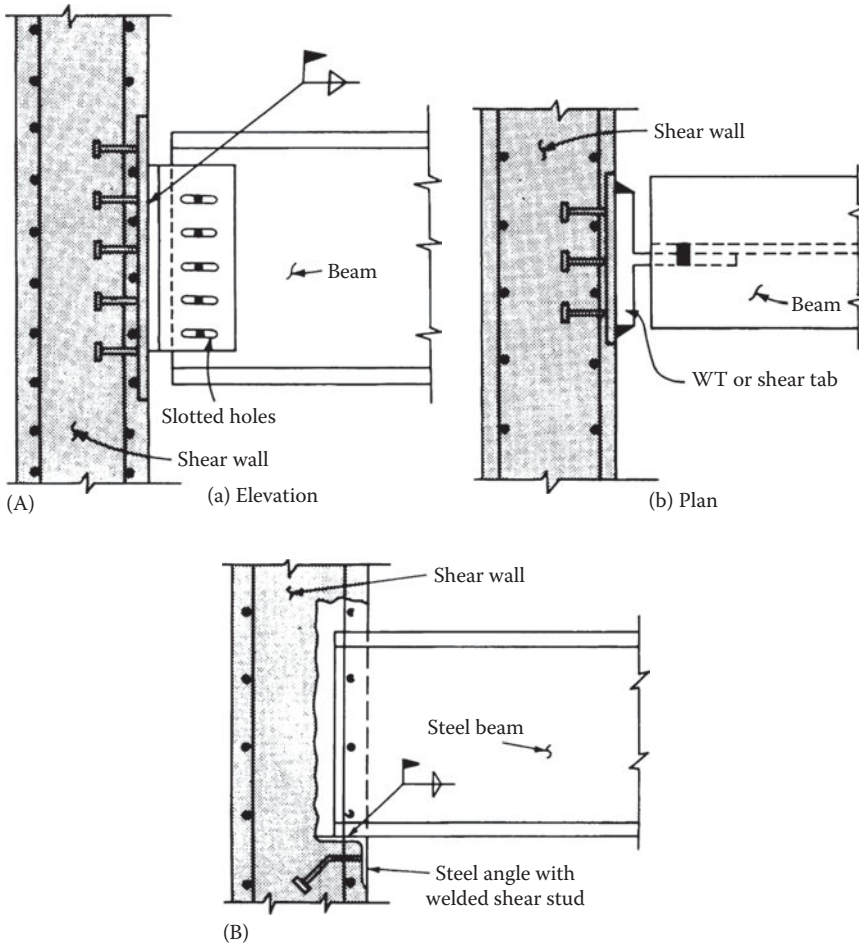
Beam-to-shear wall connection: (a) embedded plate detail; (A) elevation; (b) pocket detail. (B) plan.
